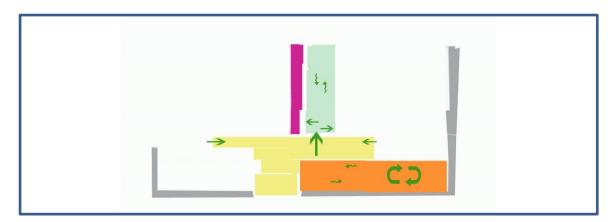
New Measured Drawing of the Mezzanine Floor
